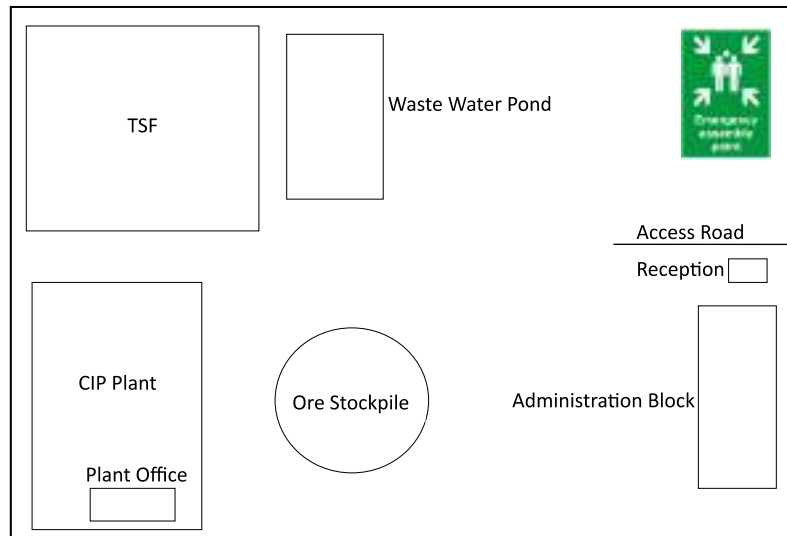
The proposed site layout, showing the arrangements of the project components
